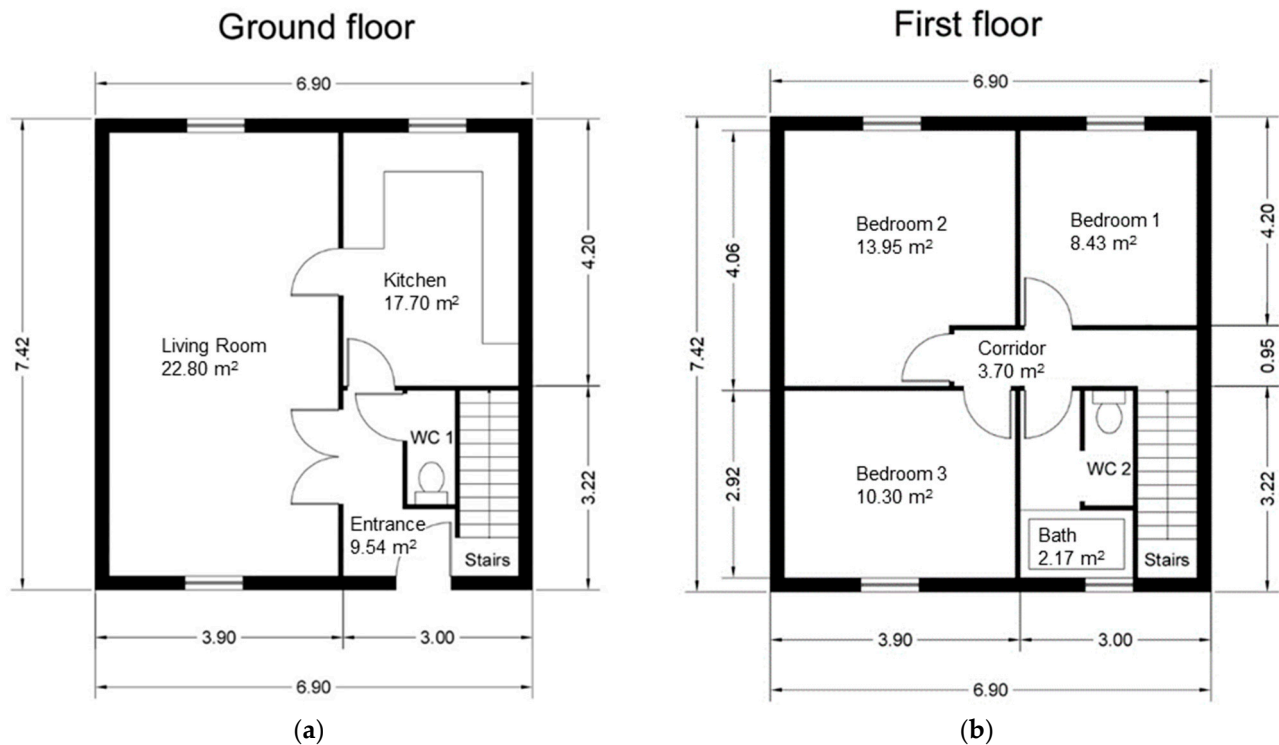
The layout of a single-family detached Puccini housing unit: (a) ground floor and (b) first floor.
